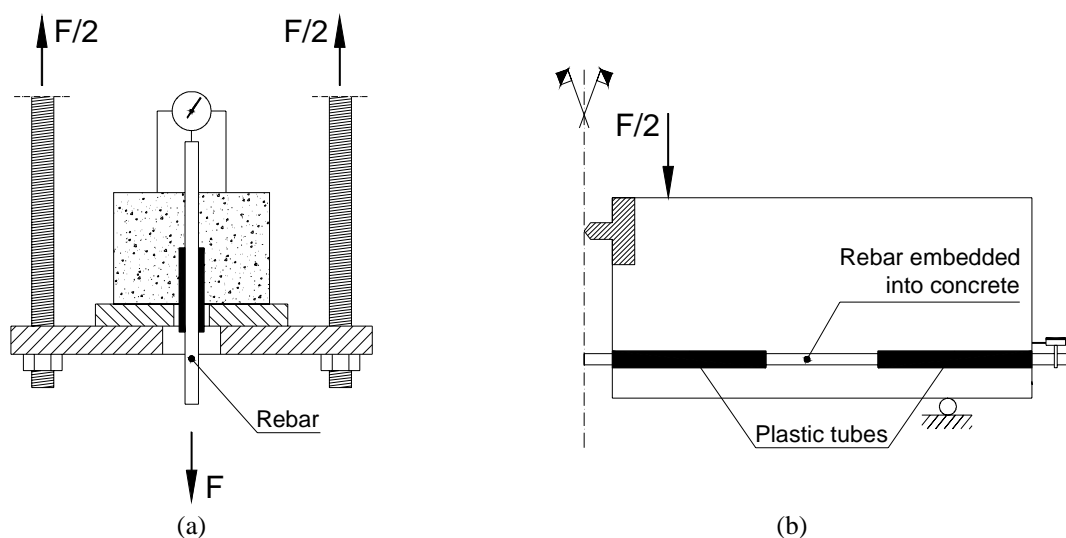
(a) Direct pullout test; (b) pullout-bending test (FIB 2000).
